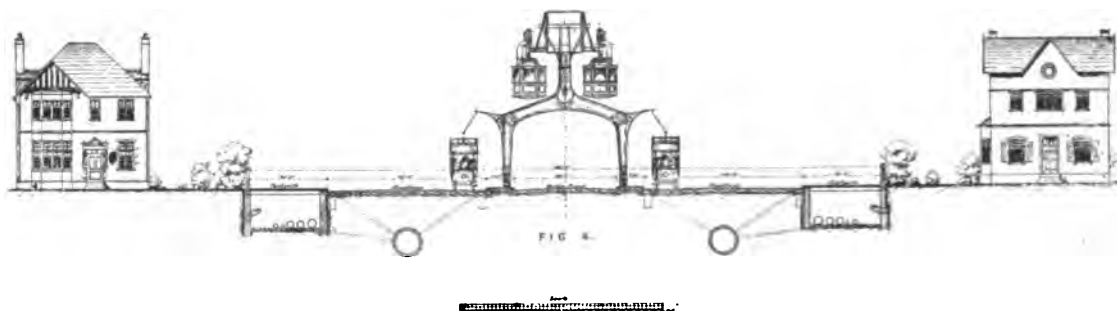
Design for a Two-storied Street and Elevated Railway. From "The Improvement of London Traffic," by Messrs. Meik and Beer.
